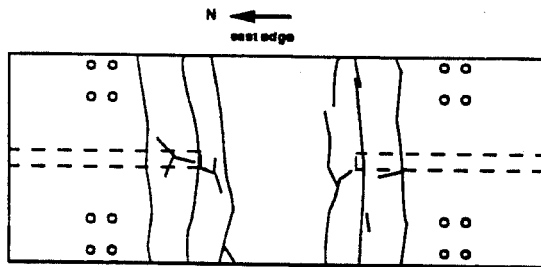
Sp. 2a: Progression of Cracking of Top Face of Roof Slab at Load Point 361
